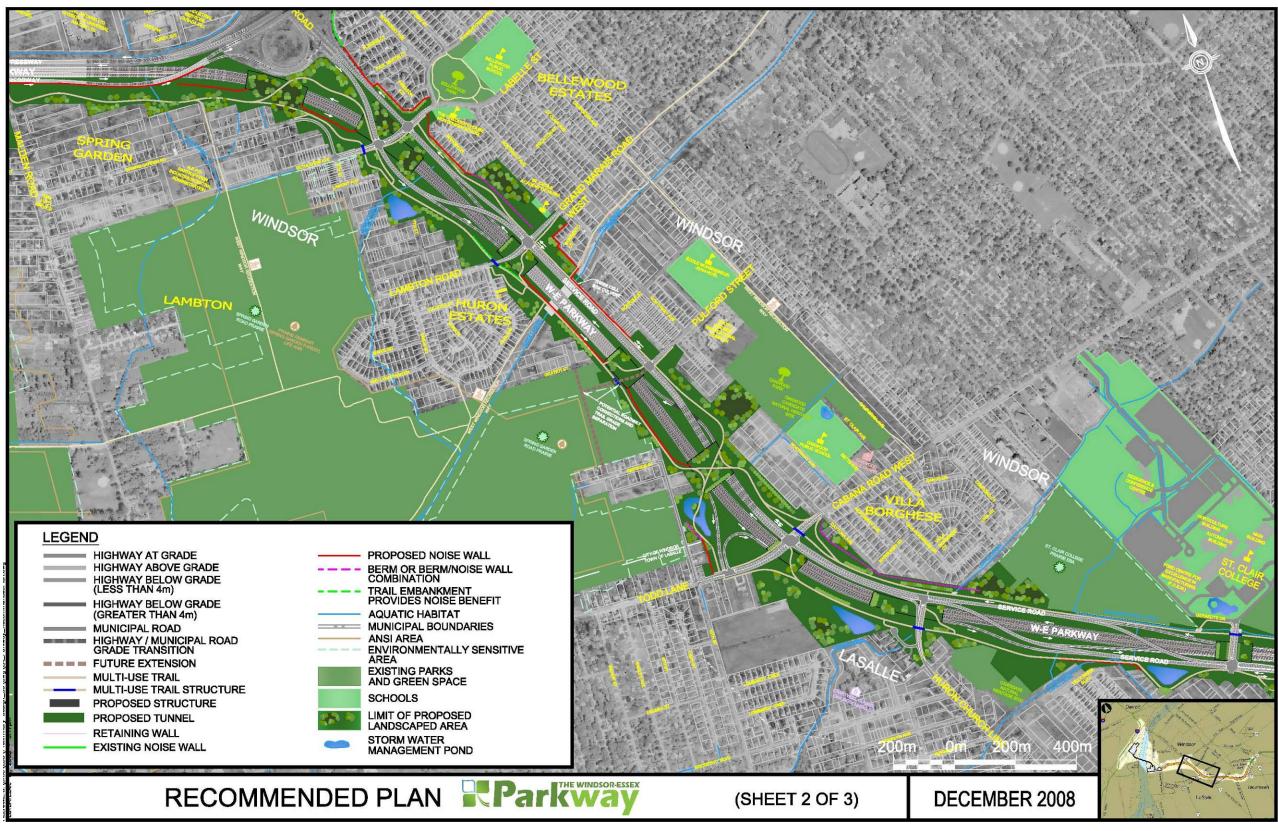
B. PROPOSED PLAN VIEW OF THE WINDSOR-ESSEX PARKWAY.
